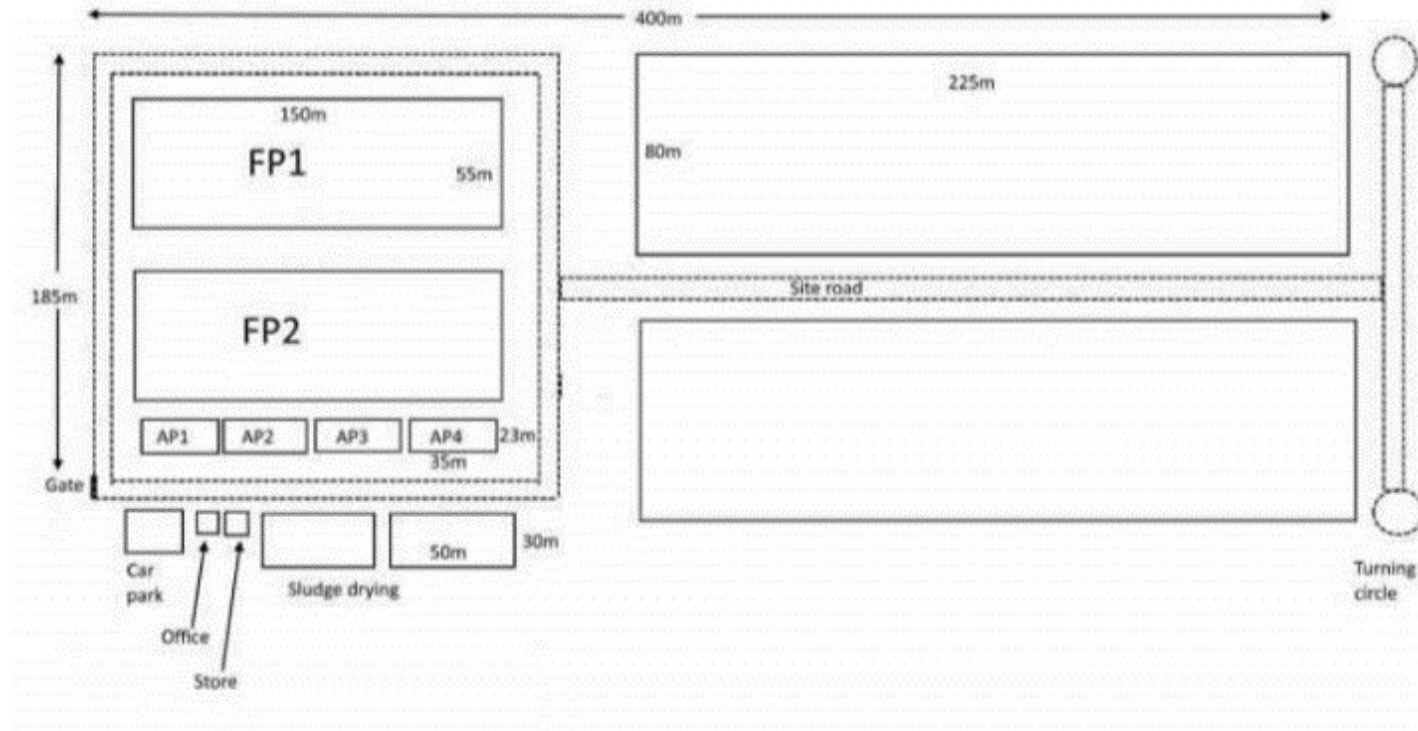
Roads East and West of the Stung Treng Wastewater Treatment Plant
